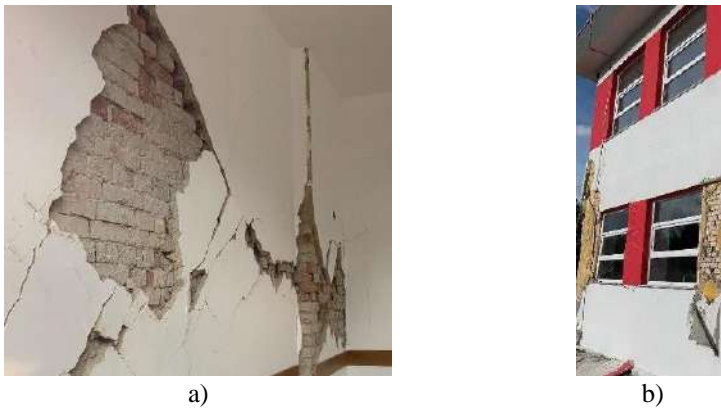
Damage of a school building in Thumanë, Albania: a) failure of the loadbearing URM wall and b) damaged masonry piers [6]
